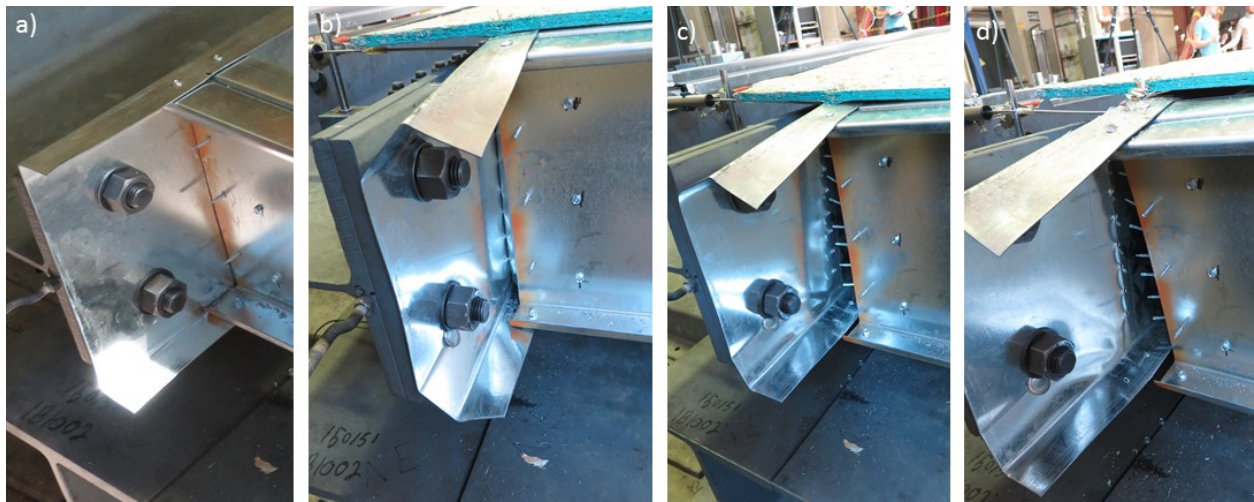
Progression Damage to Connection between Rim Joist and C-Shaped Section: a) Initial Position b) Position at Which Test was Stopped c) Position Where Connection Had Failed Completely d) Final Position
